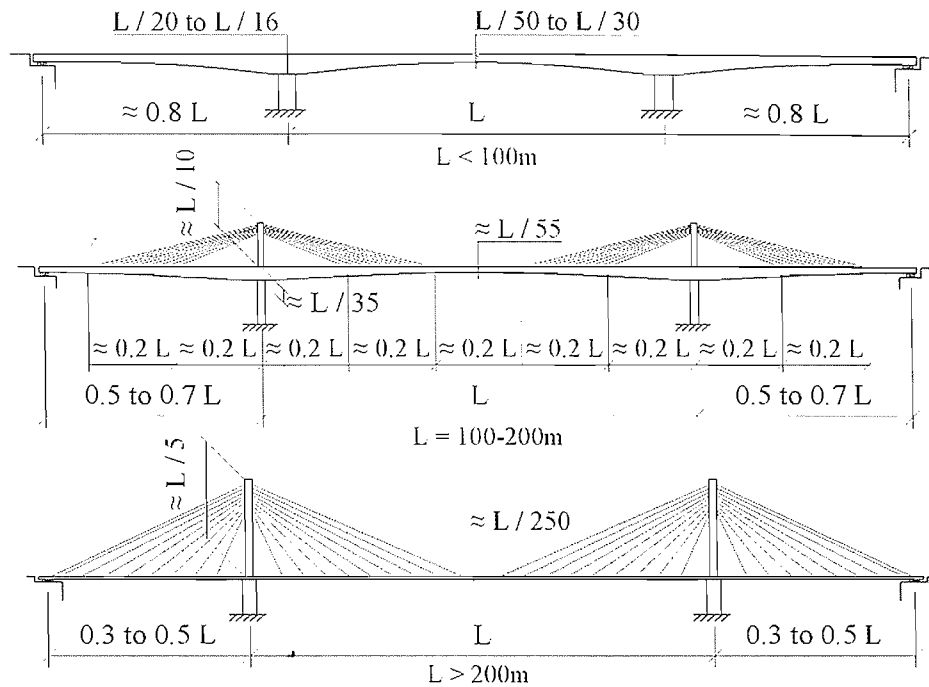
Comparison of Girder, Extradosed and Cable Stayed Bridge
